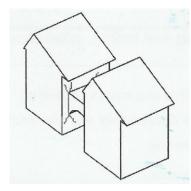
Damages due to height changes in a row and of the floor alignment (Gurrieri, 1999) connections such as piping or ducts, are vulnerable to collapse in the case of a separation between the two adjacent structures.
